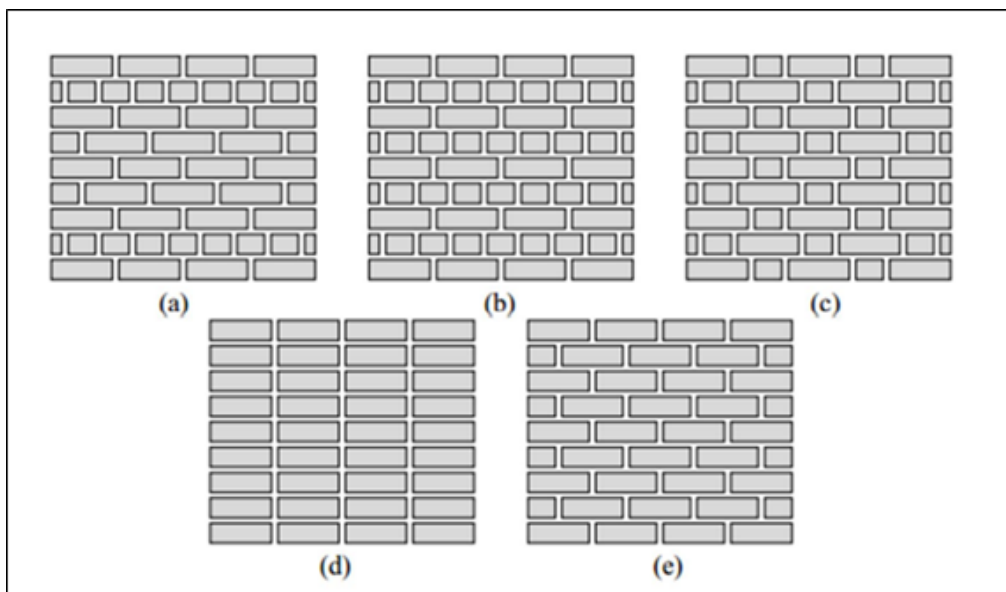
Masonry brick walls a) simple or American b) cross or English c) filament d) straight e) staggered (Lourenço, 1998; Demirkan, 2014).
